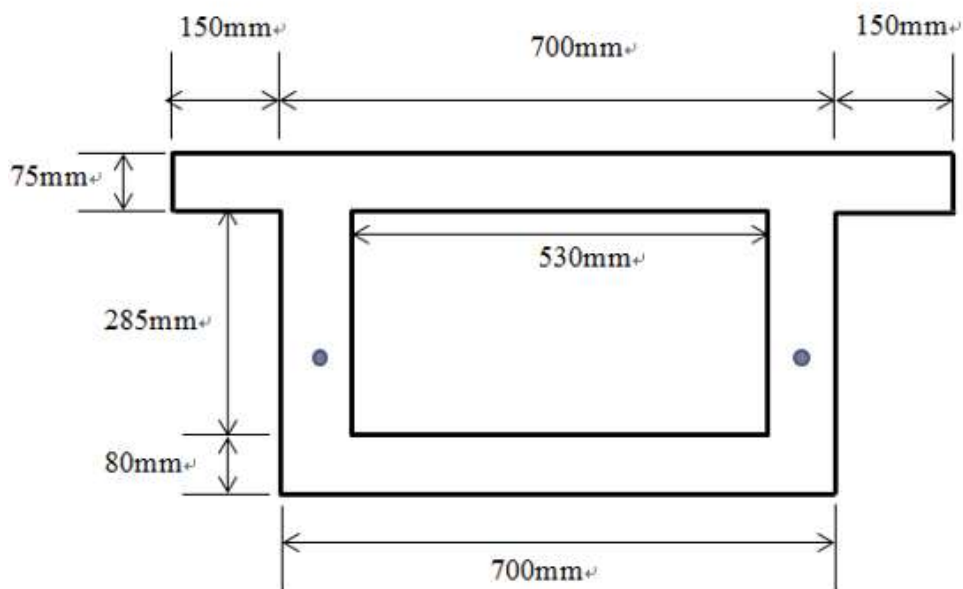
Geometry of the simply supported prestressed box girder bridge model.
